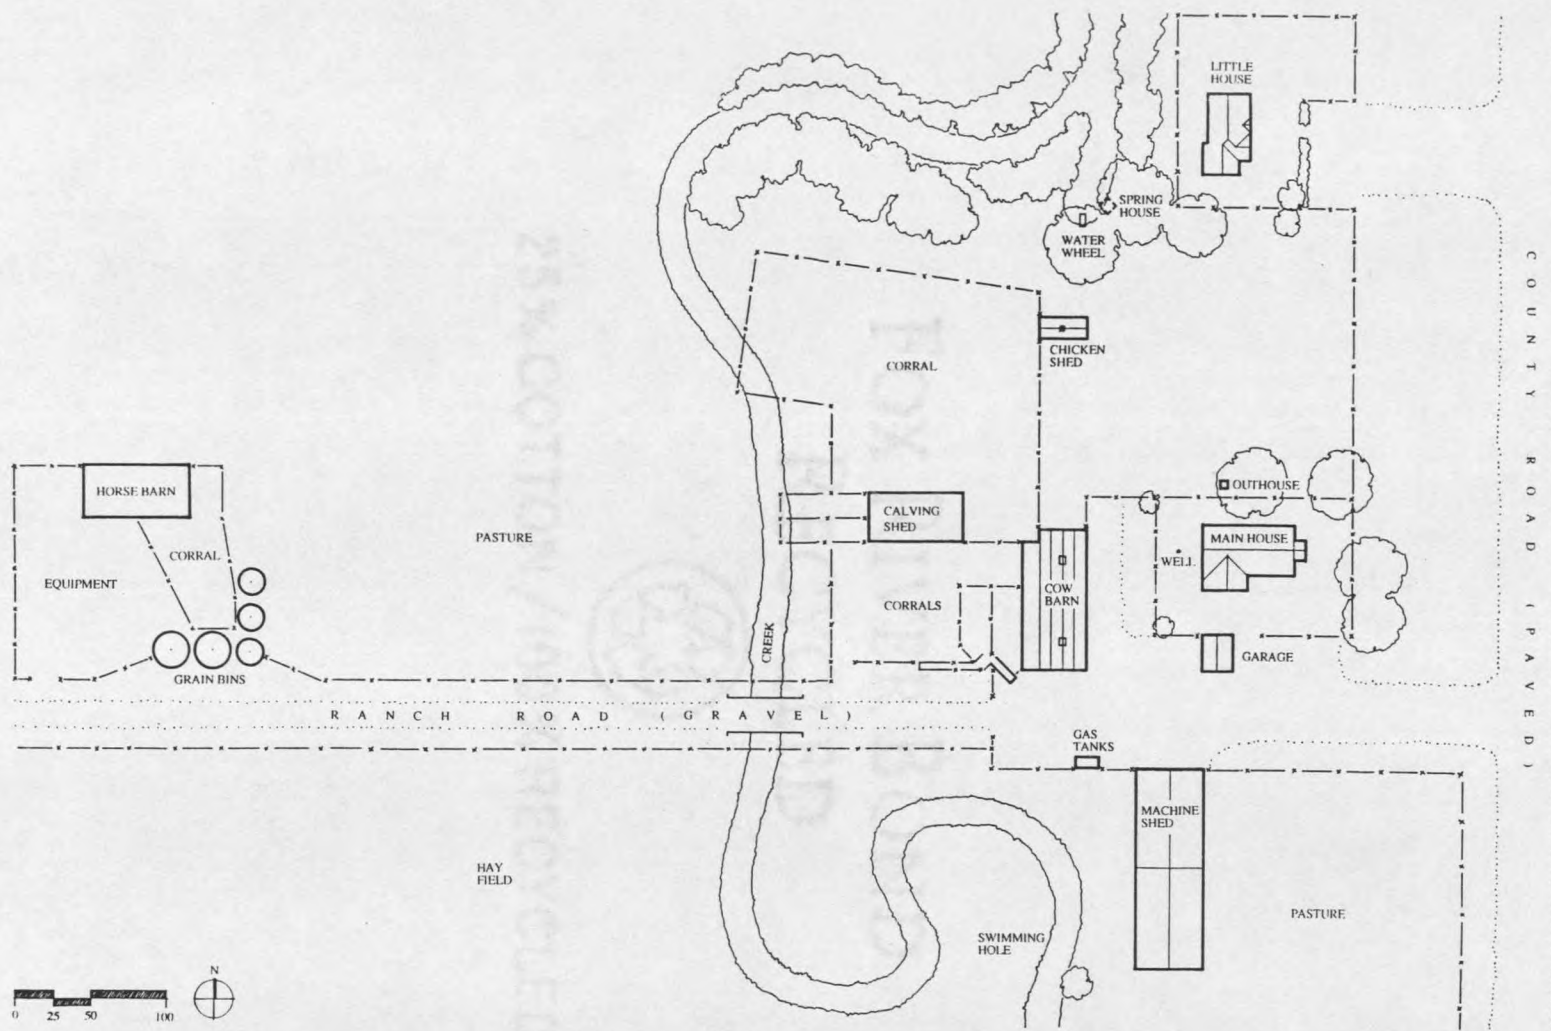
Site #2 - Site plan from 1976 to 1997. A major addition to the machine shed was the only building project that took place during this period.
